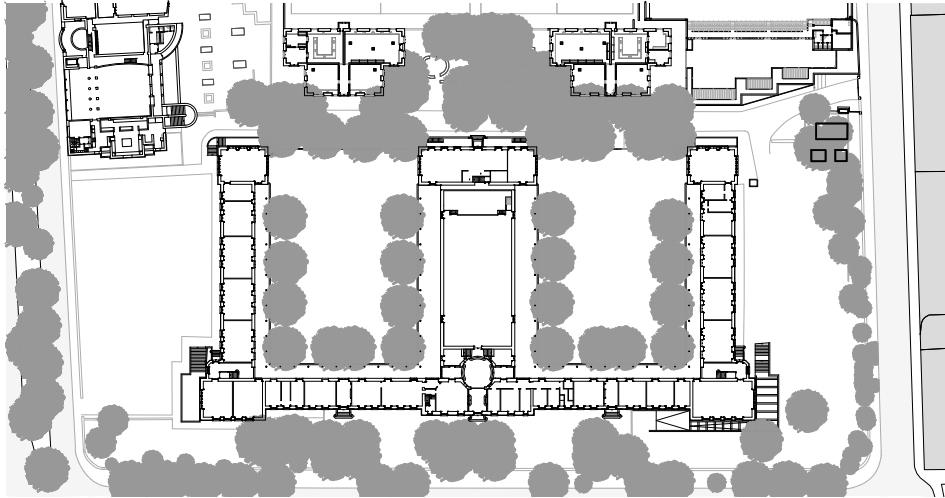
Liceu de Camões (1907-1919), Lisbon. Plan of the ground floor.
